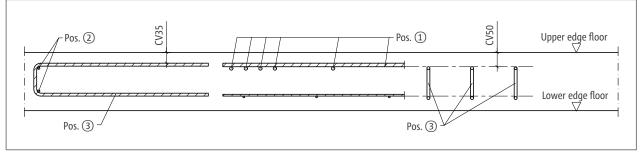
Schöck Isokorb® XT type C: On-site reinforcement outer corner (section XT type C-L-CV35, view XT type C-R-CV50)
